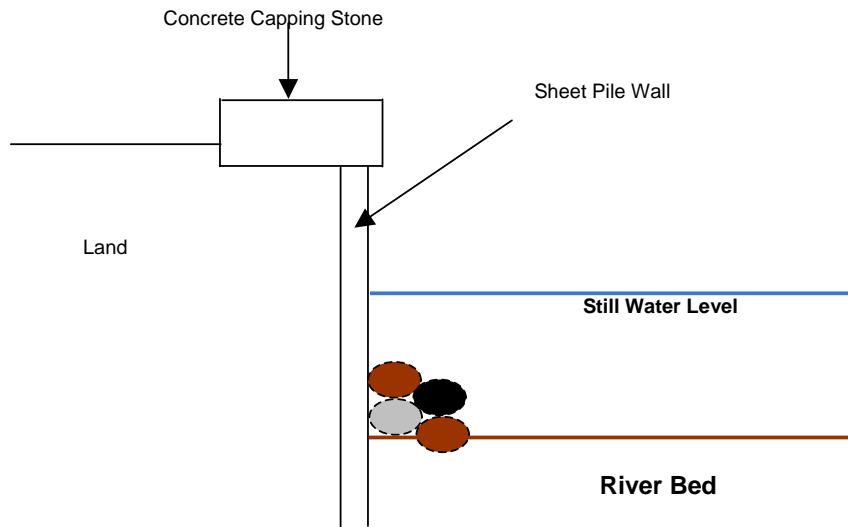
TYPICAL CROSS SECTION OF SHEET PILE WALL
